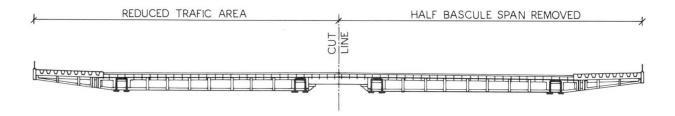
Knippels Bridge. Cross Section of Bascule Span.
